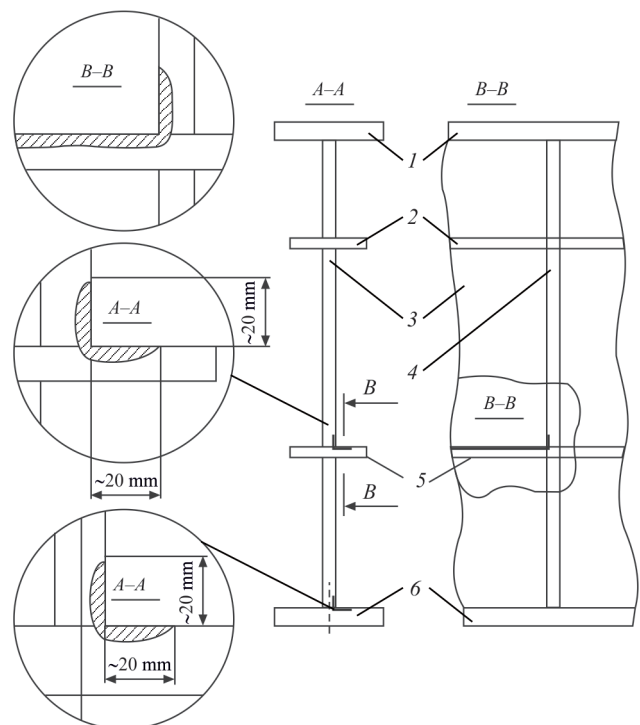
Typical corrosion damages of welded joints of truss elements of the main beams: 1 — upper flange; 2 — upper horizontal stiffener; 3 — wall; 4 — vertical stiffener; 5 — lower horizontal stiffener; 6 — lower flange
